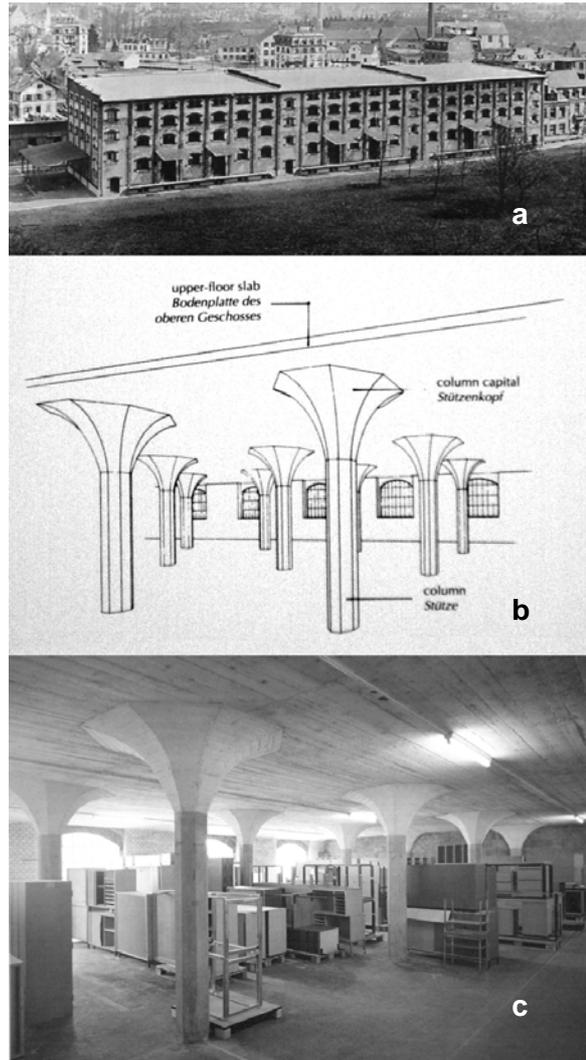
Lagerhaus Gesellschaft Building, 1910. (Marti, (a); Billington, (b) and (c))
